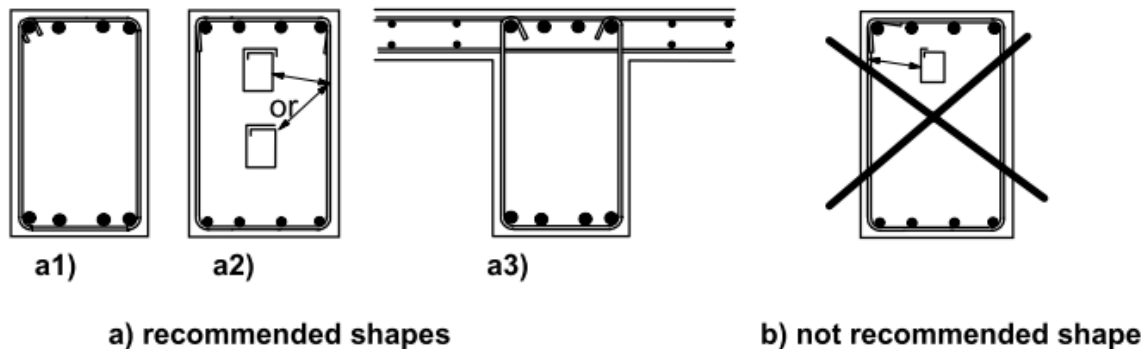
Detailing of torsion reinforcement [NEN-EN 1992-1-1]
